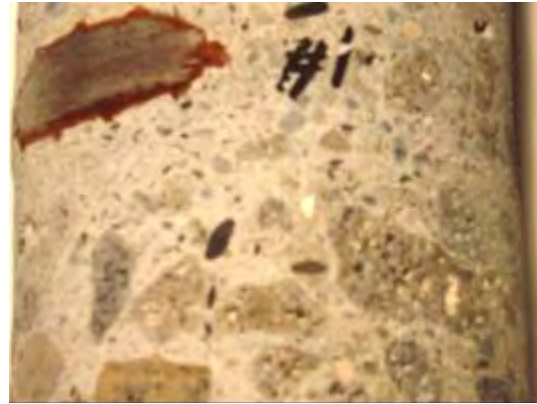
Core 7a reinforcement is rusted and concrete is porous
